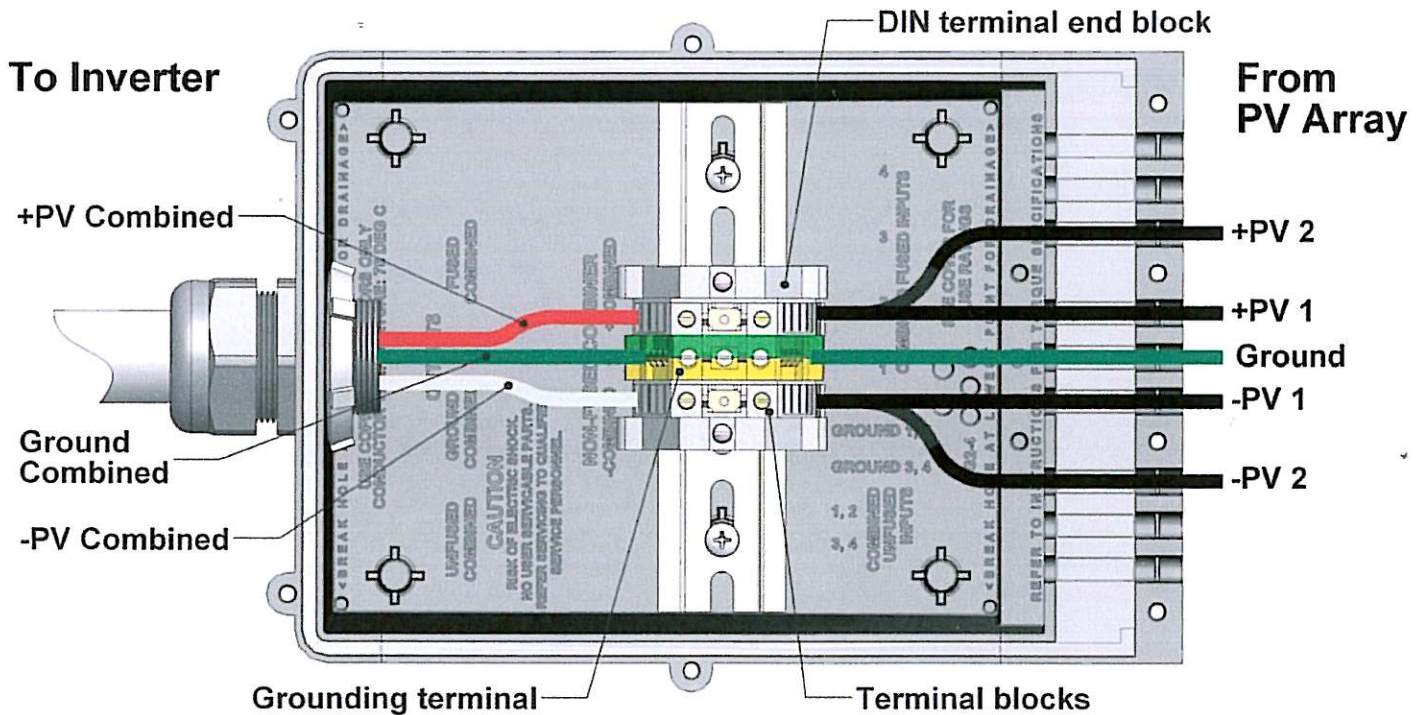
Wiring Layout – Two -String Combiner with DIN Rail Mount Components
